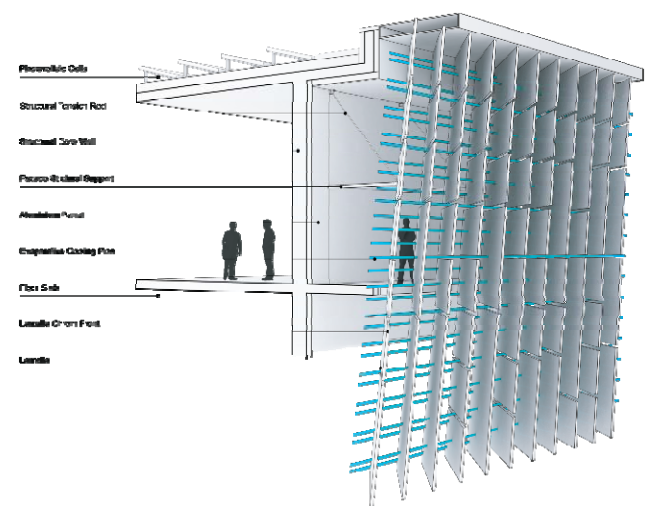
Section perspective of Façade type 2 with balcony transitional space behind fixed shading and evaporative cooling pipes
